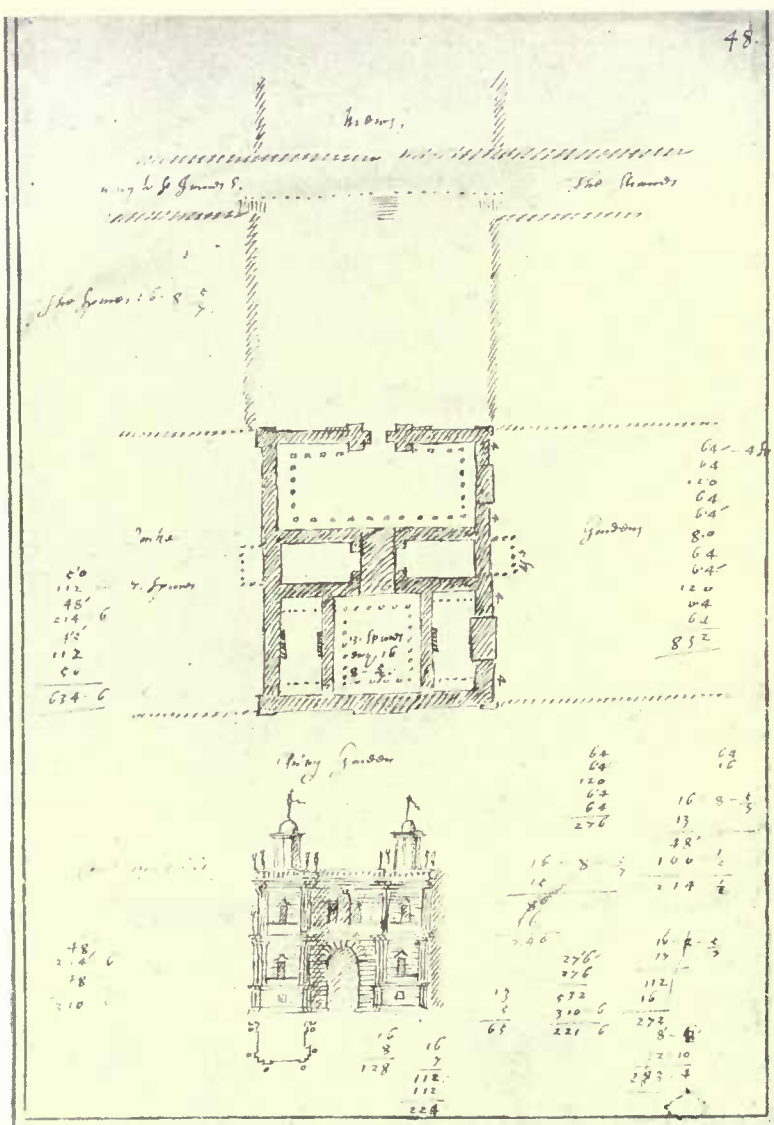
BLOCK PLAN OF A SCHEME FOR WHITEHALL PALACE
